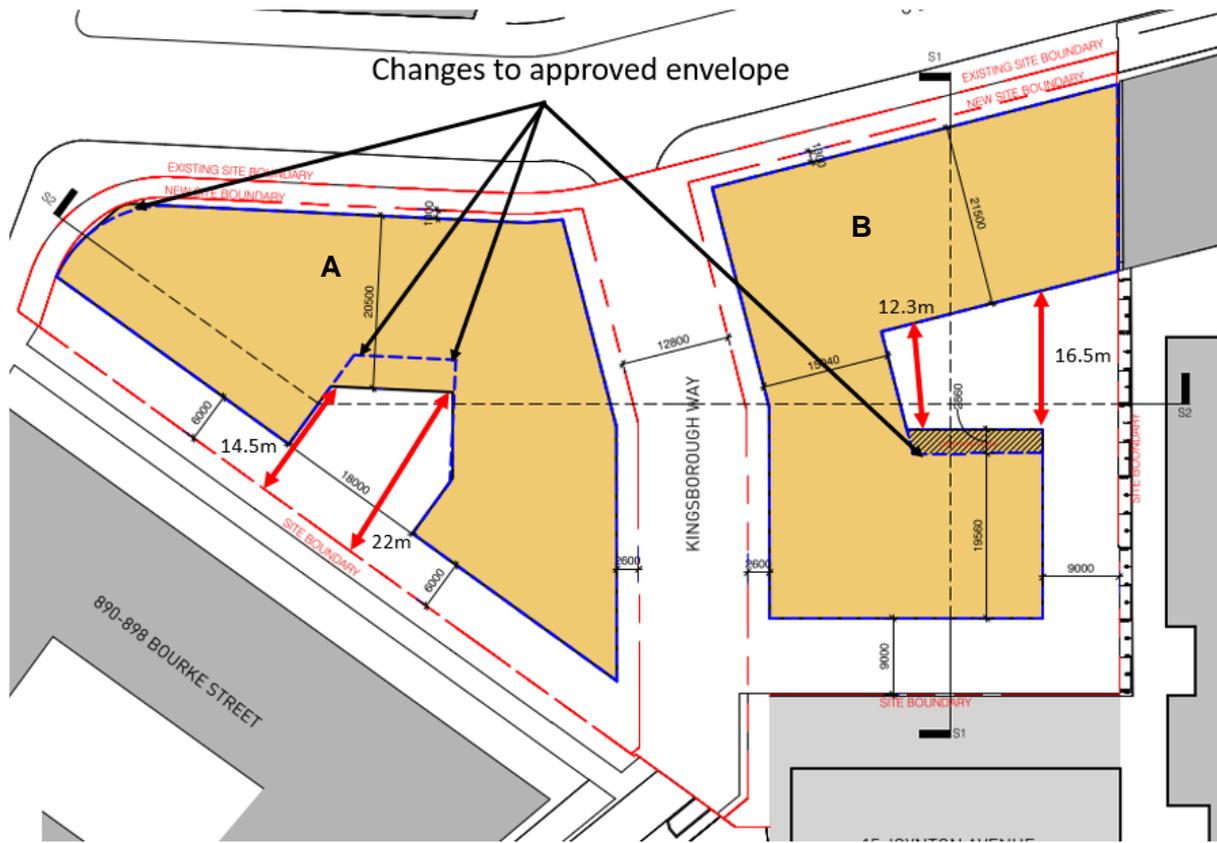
Proposed concept envelope floor plan (ground to level 3) depicting increased floorplate. The approved envelope is outlined in blue.
